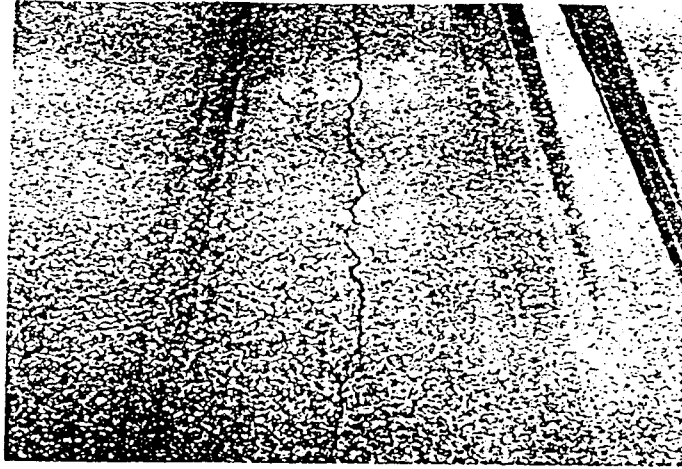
Low severity joint reflection cracking, nonfilled crack
